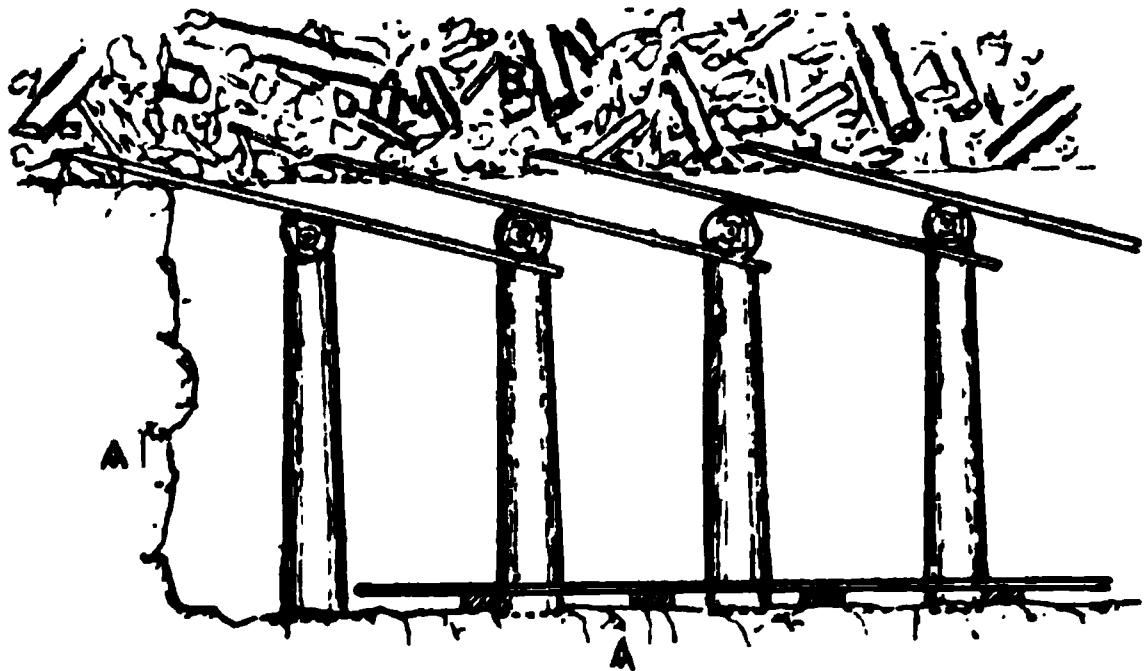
SECTION SHOWING MODE OF TIMBERING WITH A BROKEN ROOF OR “LOOSE TOP.”
